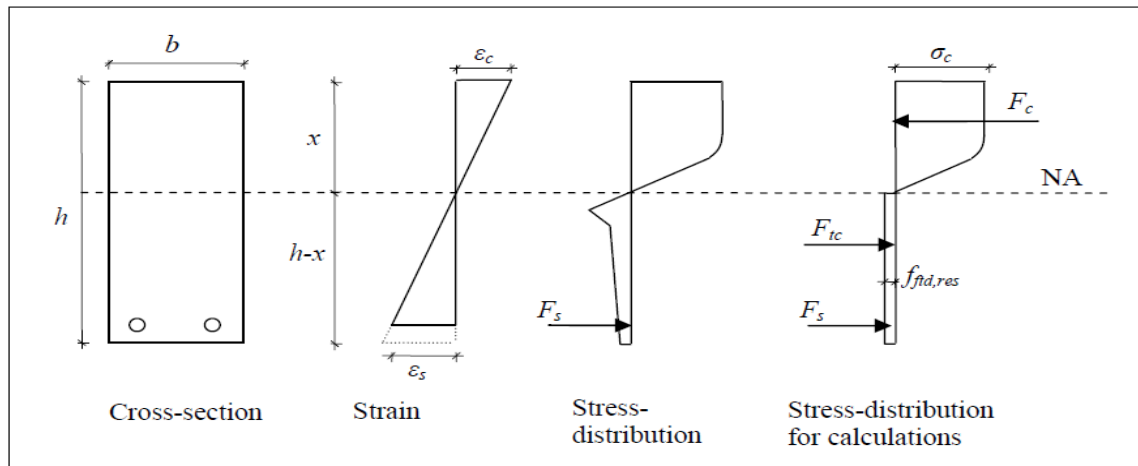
Strain and stress of concrete reinforced composite ref.(17)
